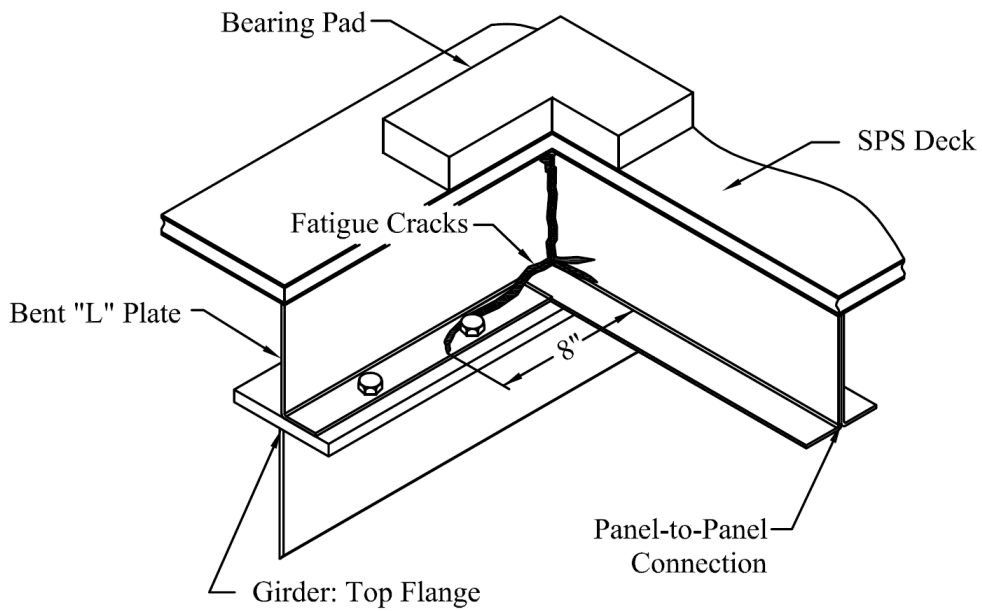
Location of the weld cracks at 700,000 cycles
